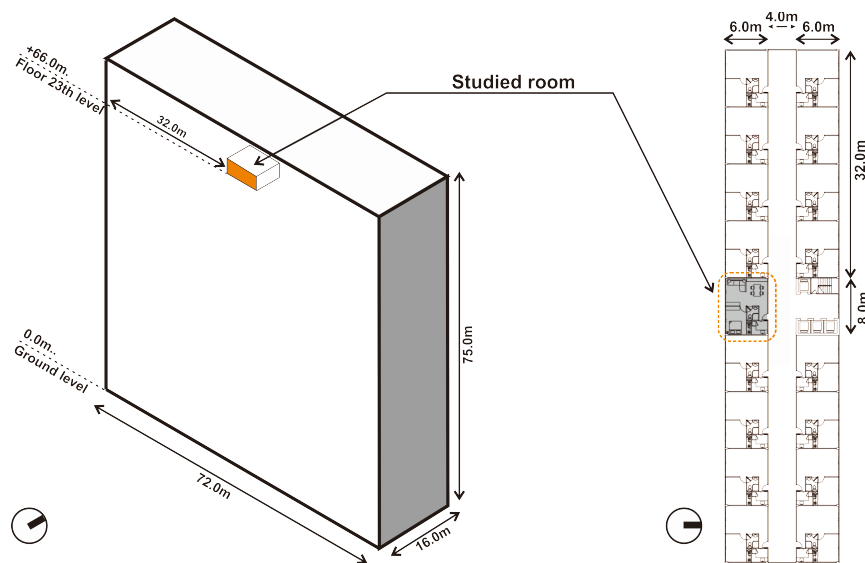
Hypothetical building for the study: (left) geometry of the building; and (right) typical floor layout and orientation of the building (the studied room was presented in grey).
